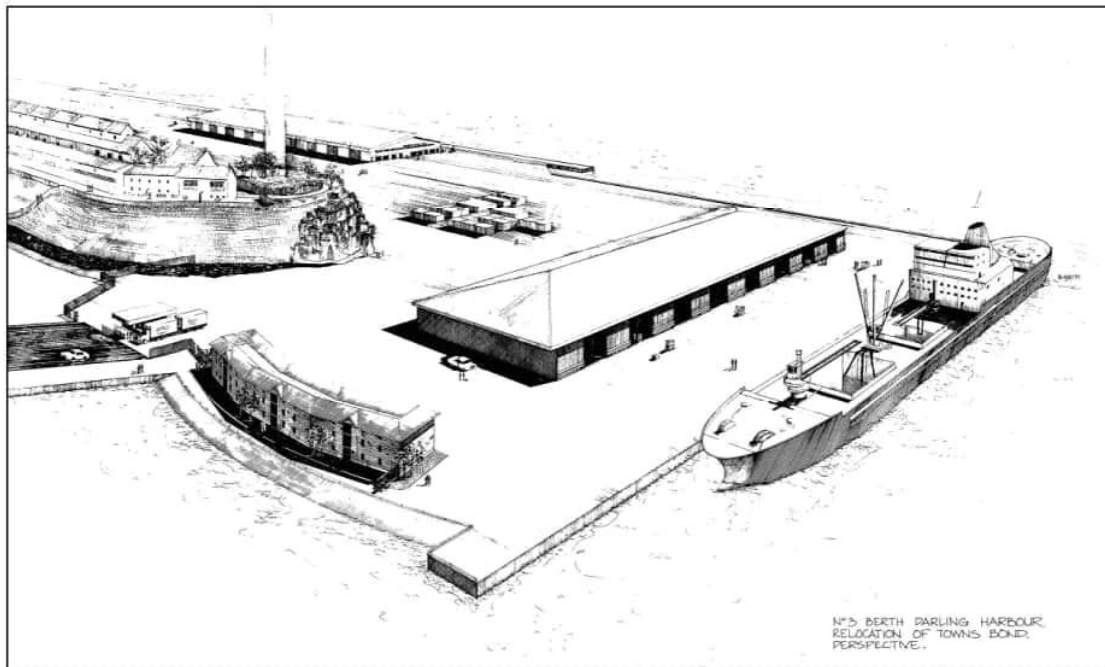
Extract of 1978 plan displaying the relocation perspective of the Moore's Wharf building (Source: Historical plans provided by GroupGSA)
